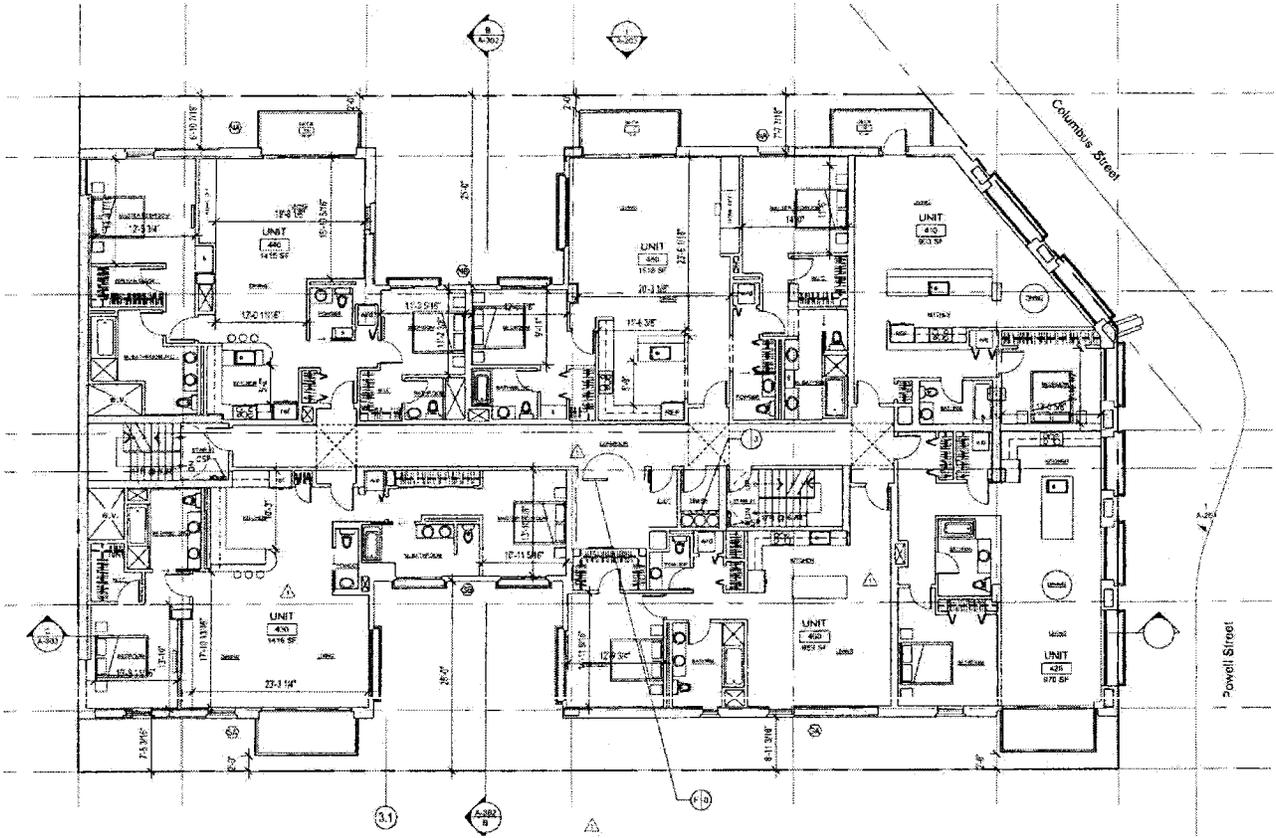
PROPOSED 1731 POWELL ST FOURTH LEVEL PLAN
